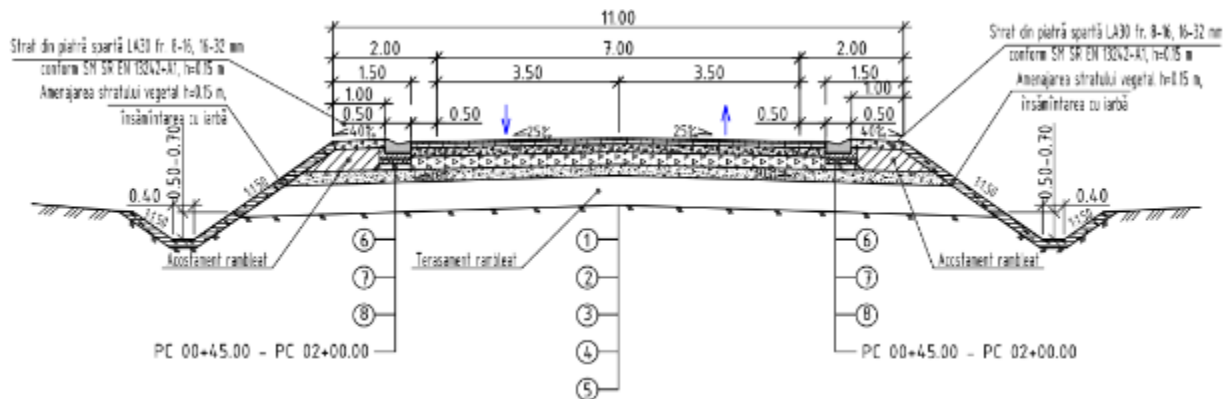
Typical transverse profile on the section of the bypass road of Giurgiulesti village
